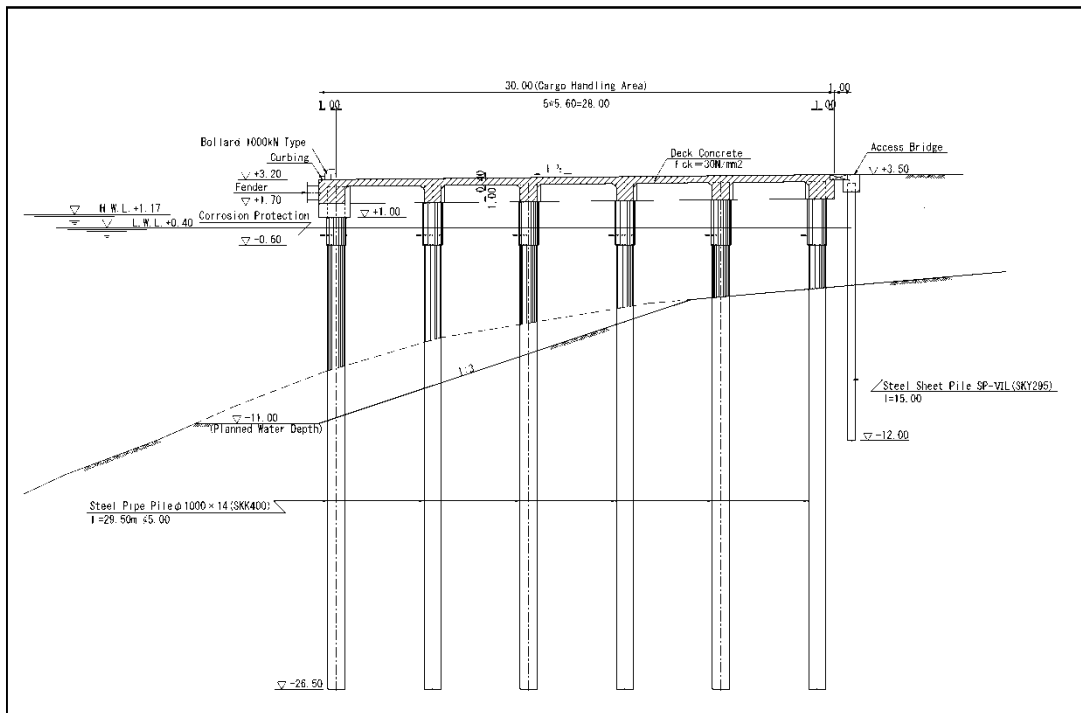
Cross Section of Steel Pipe Pile Open Jetty Type
